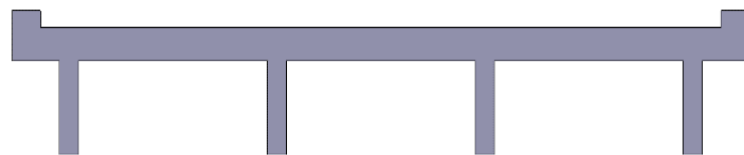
Cross-section of bridge deck in multi-span bridge models.
